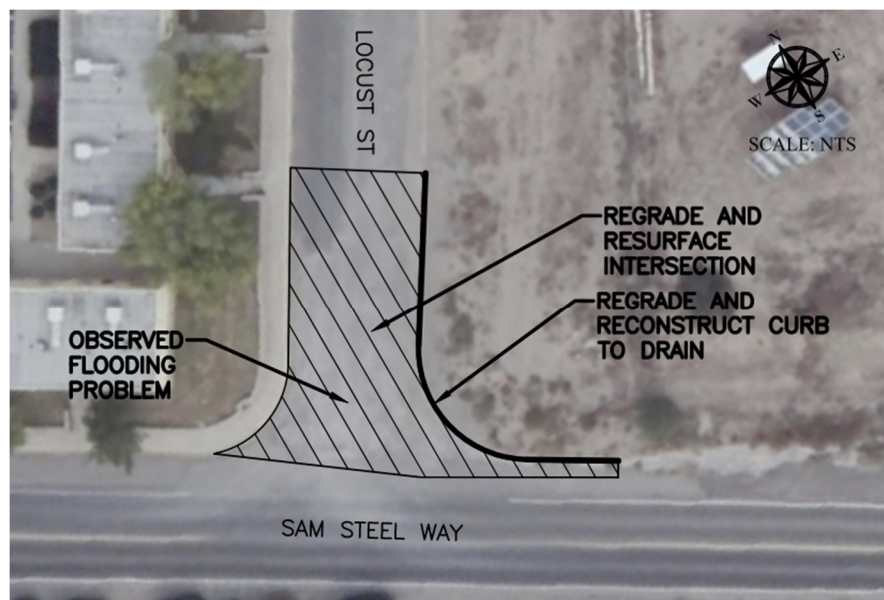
LOCUST ST AND SAM STEEL WAY INTERSECTION
